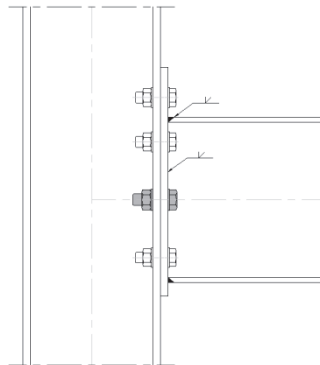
Bolted beam-to-column joints detailing rules – additional bolt row and beam-endplate weldings
